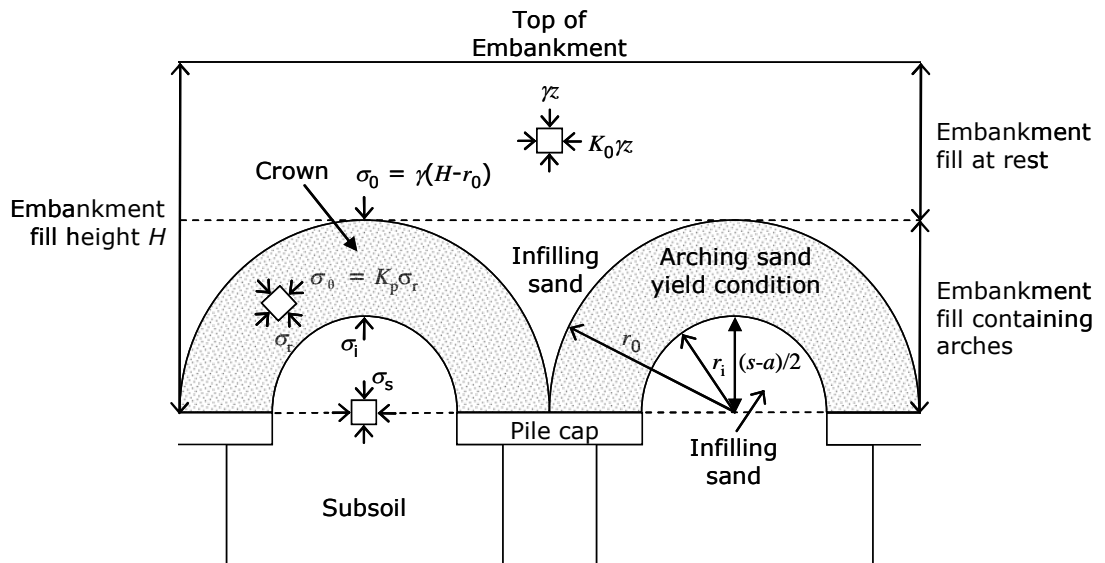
Section through a piled embankment (Hewlett & Randolph, 1988)
